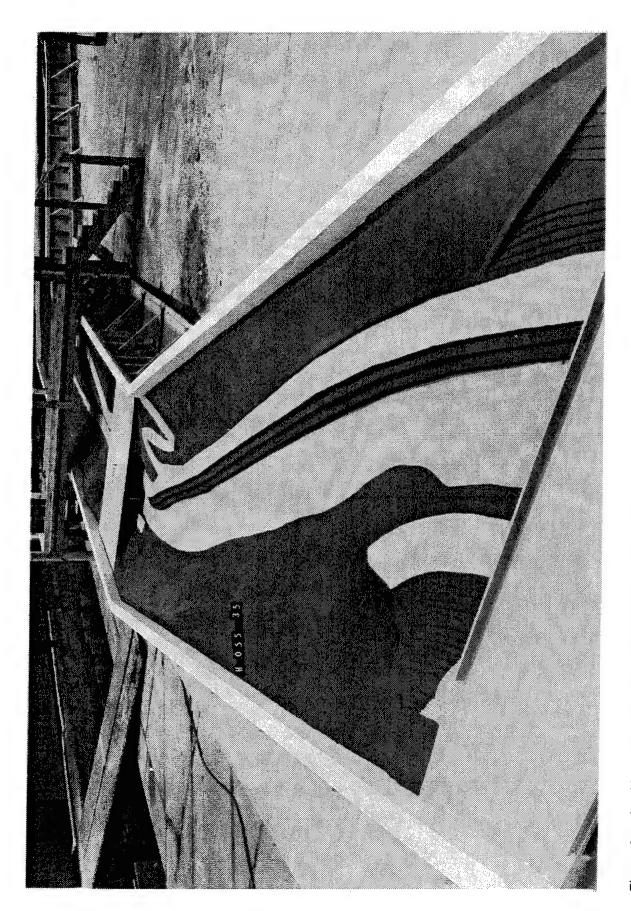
Looking upstream from Park Avenue to San Carlos Street
